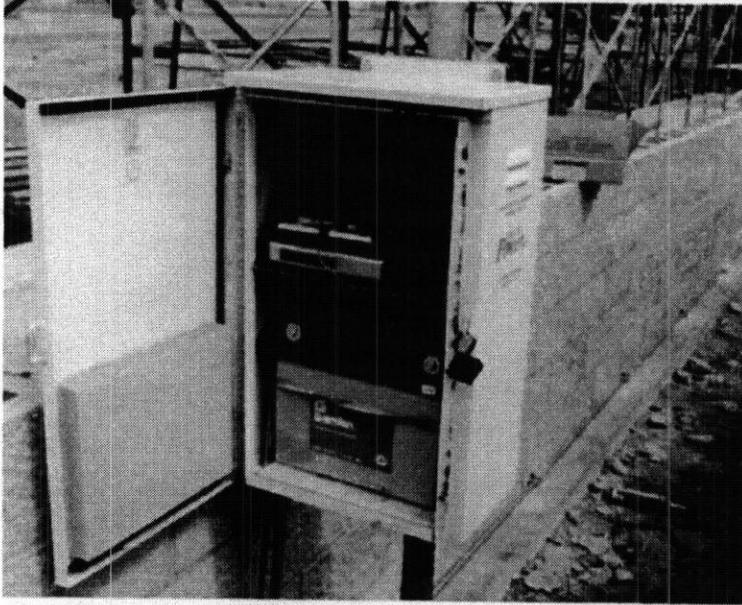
View of the instrument cabinet and the partially built post-tensioned wall in the background.
